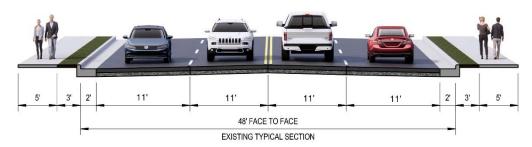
Pilgrim Drive to E. Adams Street (South) Existing Typical Section, facing north
